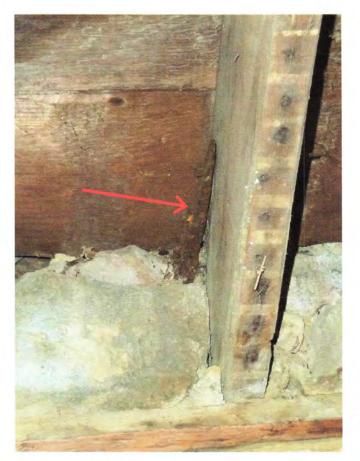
Close-up view of interior leg of anchors at facades (arrow).
